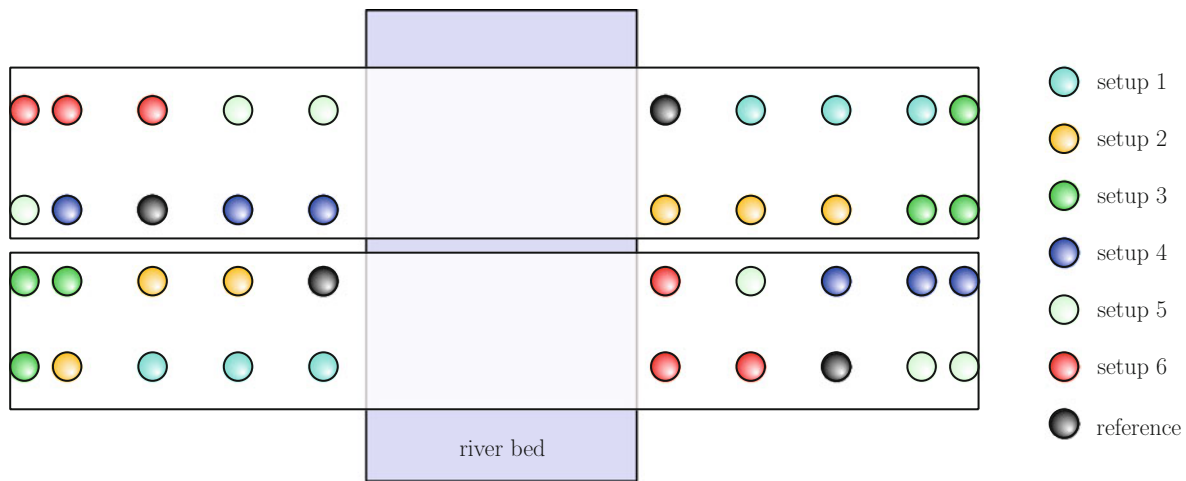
Sketch of measuring points instrumented in six setups in plan
